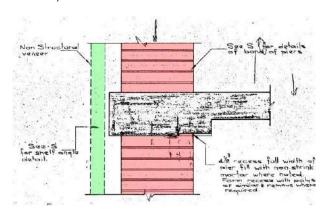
A vertical section showing the arrangement of the masonry and reinforced concrete slab. Shaded in red indicates the loadbearing masonry and in green indicates non-loadbearing brick veneer. The writings on the left-hand side note: 'non-structural veneer' and 'see [section] for shelf angle detail'. (Source: Buchan, Laird & Buchan 1971 copyright)
